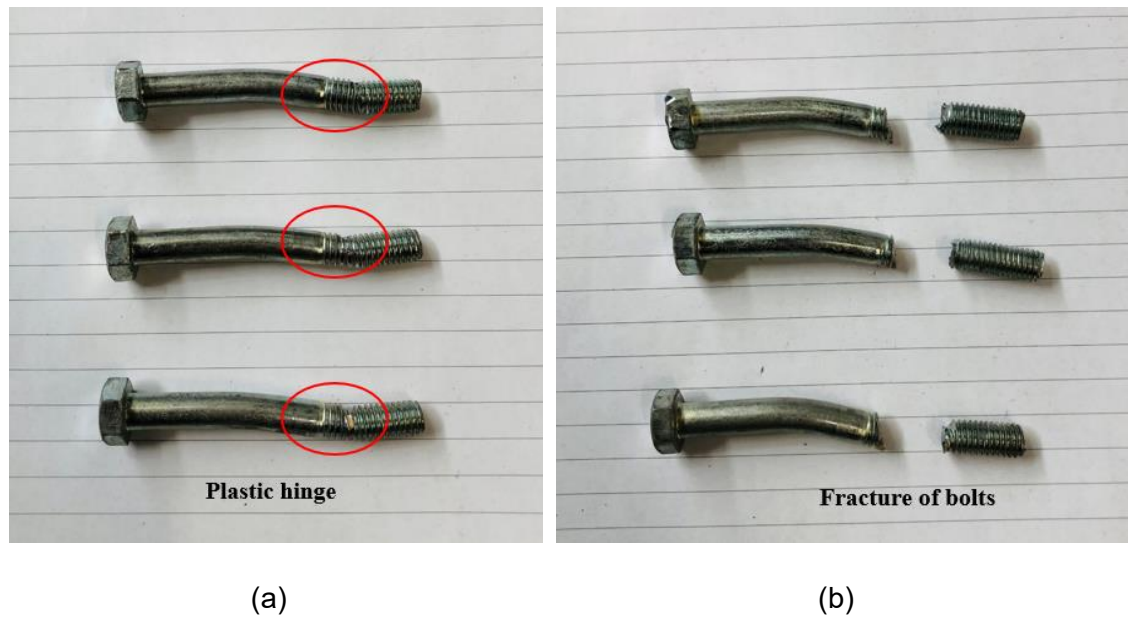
Failure modes of the specimens with M8 nut and bolts (with washers): (a) plastic hinge formation; (b) fracture of bolts
